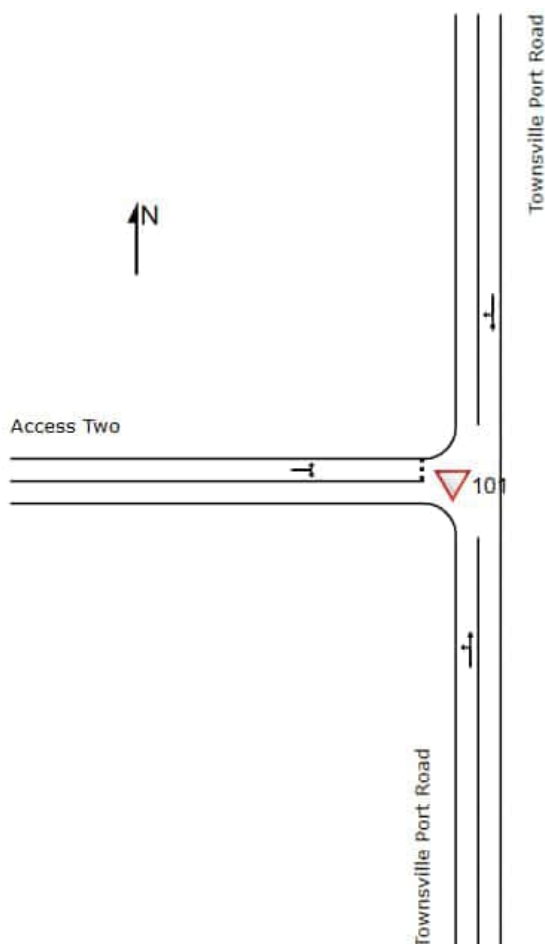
Access 2 / Townsville Port Road intersection – indicative SIDRA layout
